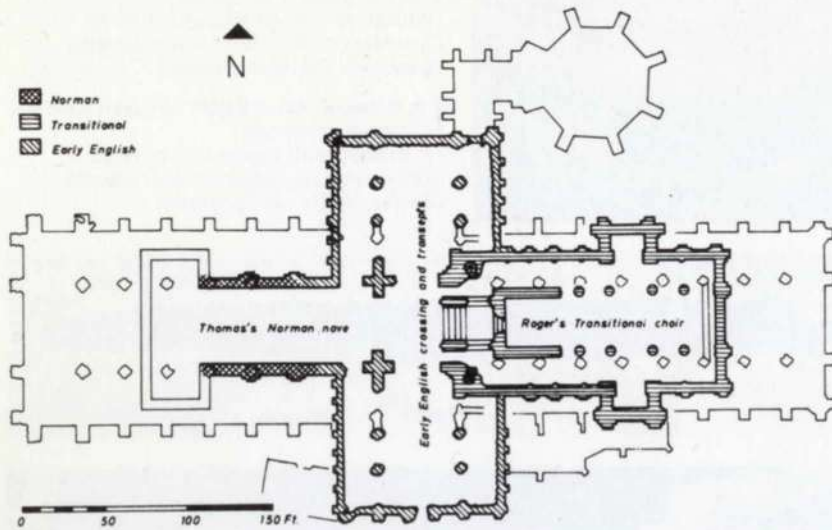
Conjectural plan of Minster c.1350. Illustrator: Margaret Woodward.
